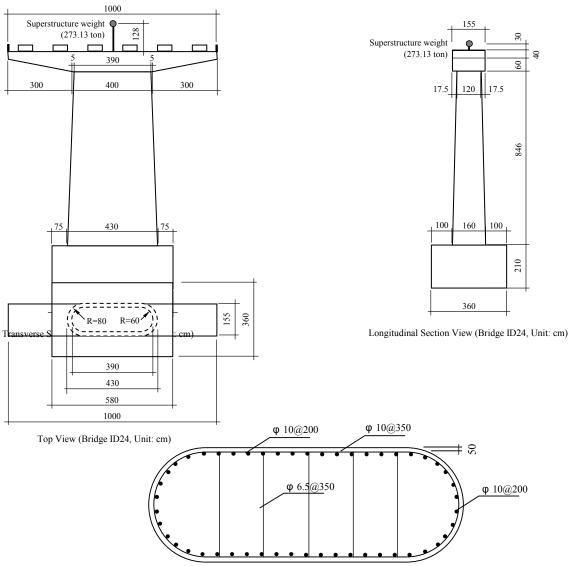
Dimension of bridge pier and bar arrangement (Bridge No.24)
